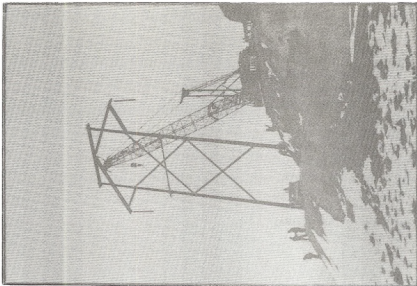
C.—Tire-mounted, 60-ton crane erecting a slightly larger version of the structure used in a 230 kv-line.
